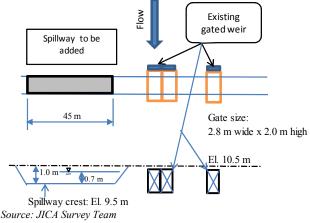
Improvement Plan of Existing Weir on Stung Touch at Thmei
